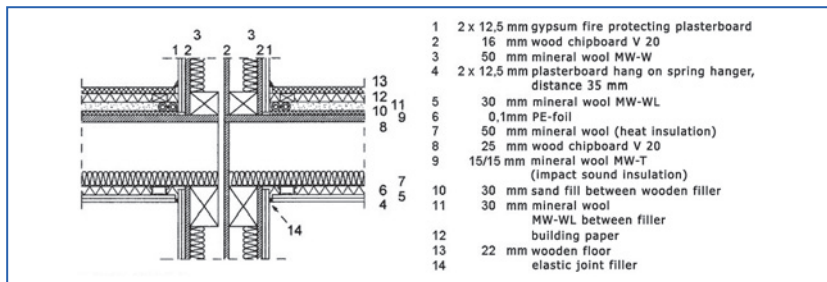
Connection between wall separating flats and floor (vertical section).
